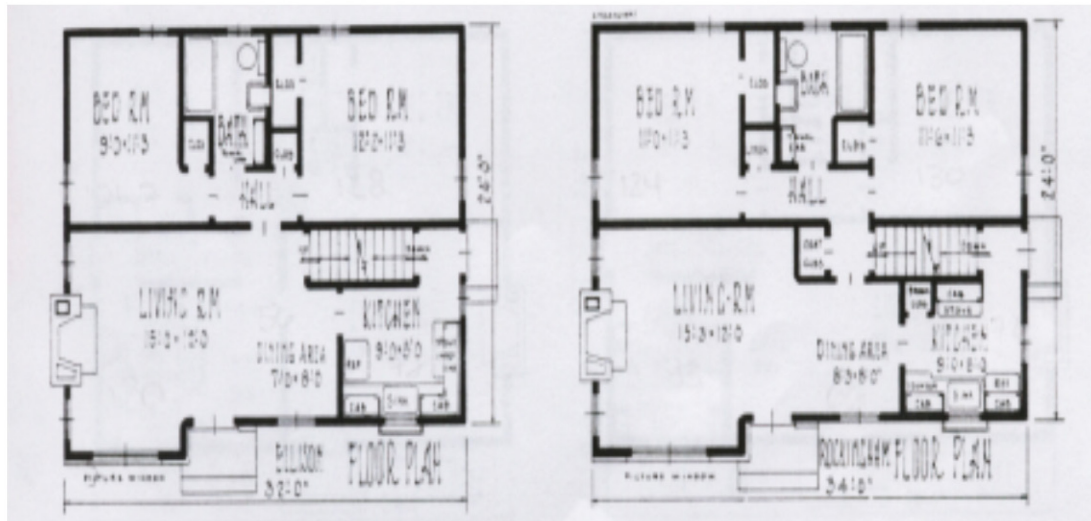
Exhibit E: Home Plan Book Company. "The Book of Well Planned Homes: Designs and Floor Plans for 47 Well Planned Homes." St. Paul: Home Plan Book Co., 1953 (27)
